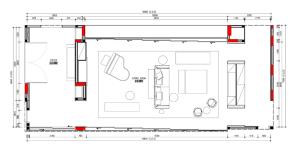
Layout of foyer & living room, Wungkal House Source: Document of SS (2021)
